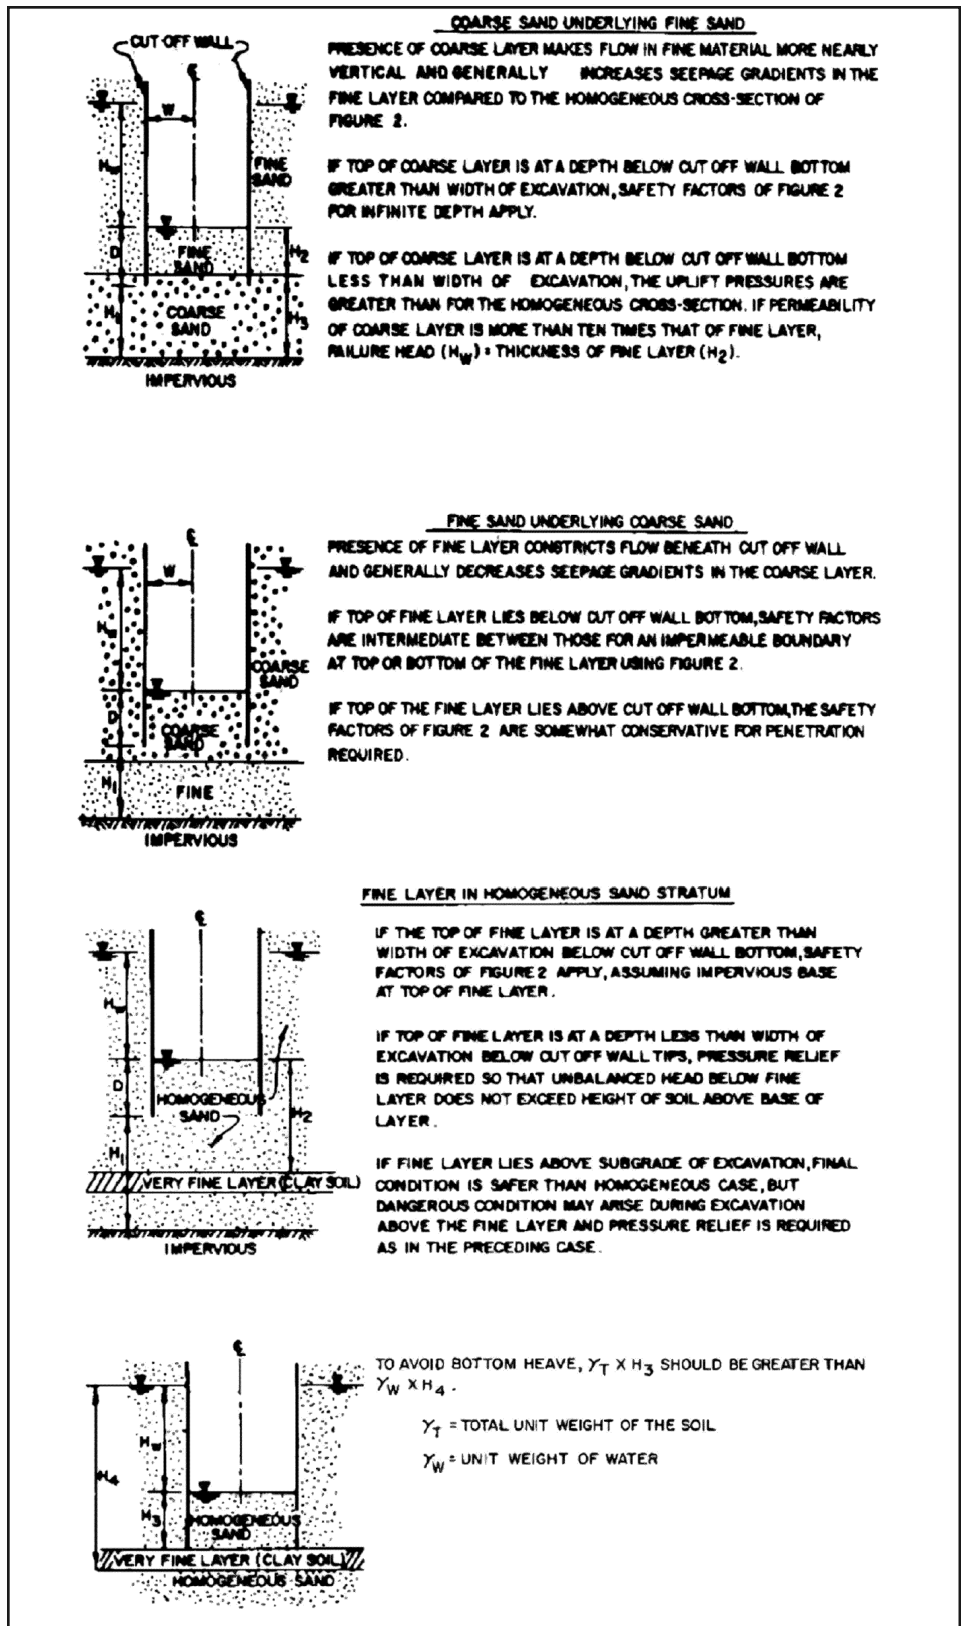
Depth of Sheet Piling in Stratified Sand to Prevent Piping in a Braced Cofferdam
